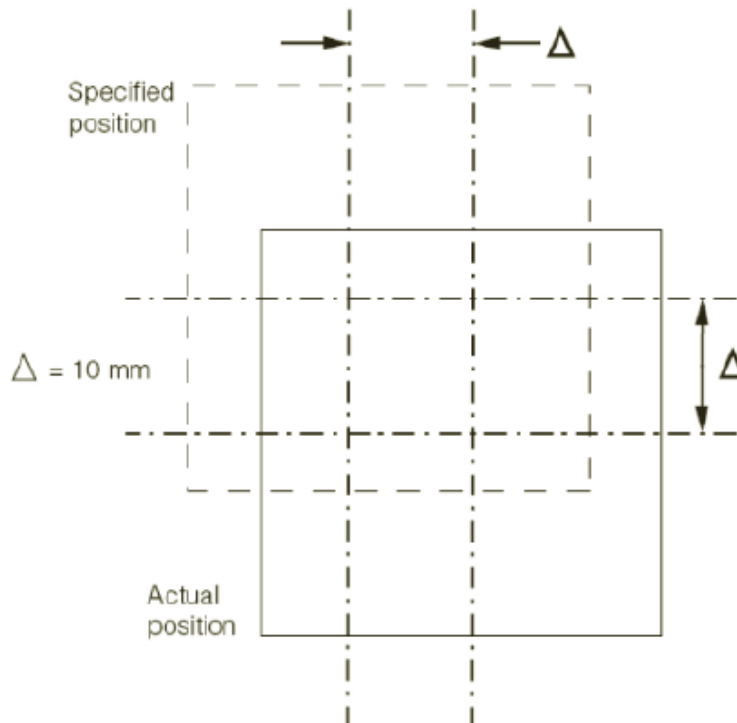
Tolerances on Cast-in Fixing Plates
